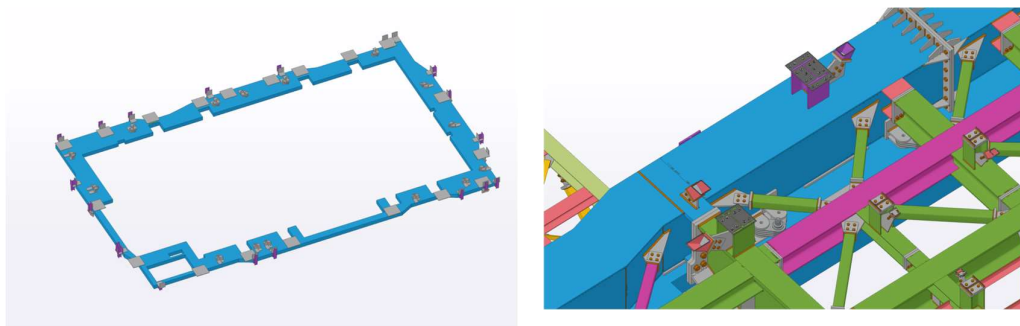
Fabrication model details: Bearings, dampers, stoppers (left), Perimetric beam connections (right).
